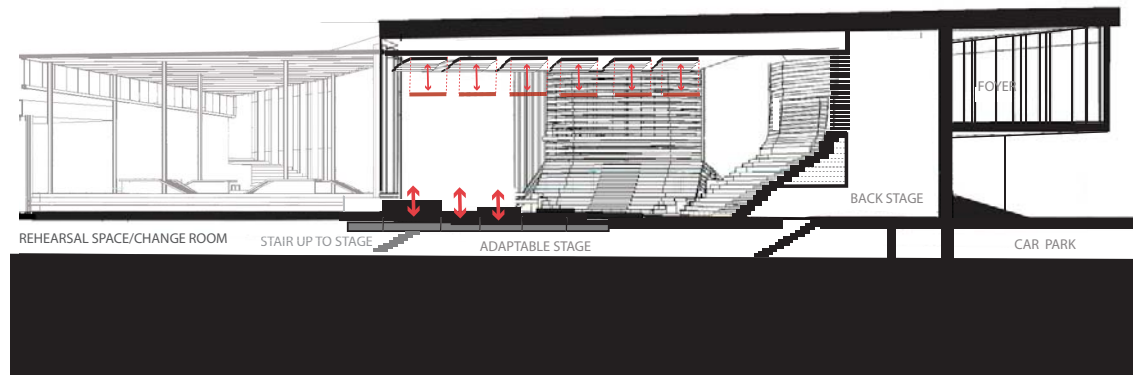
Section through the theatre space. The floor has adaptable panels that can be elevated and lowered or placed at ground level. By lowering the floor, this allows for an orchestra pit. The ceiling panels can also be raised or lowered depending on the intimacy required in the performance. Access into the theatre can be achieved via the upper foyer
